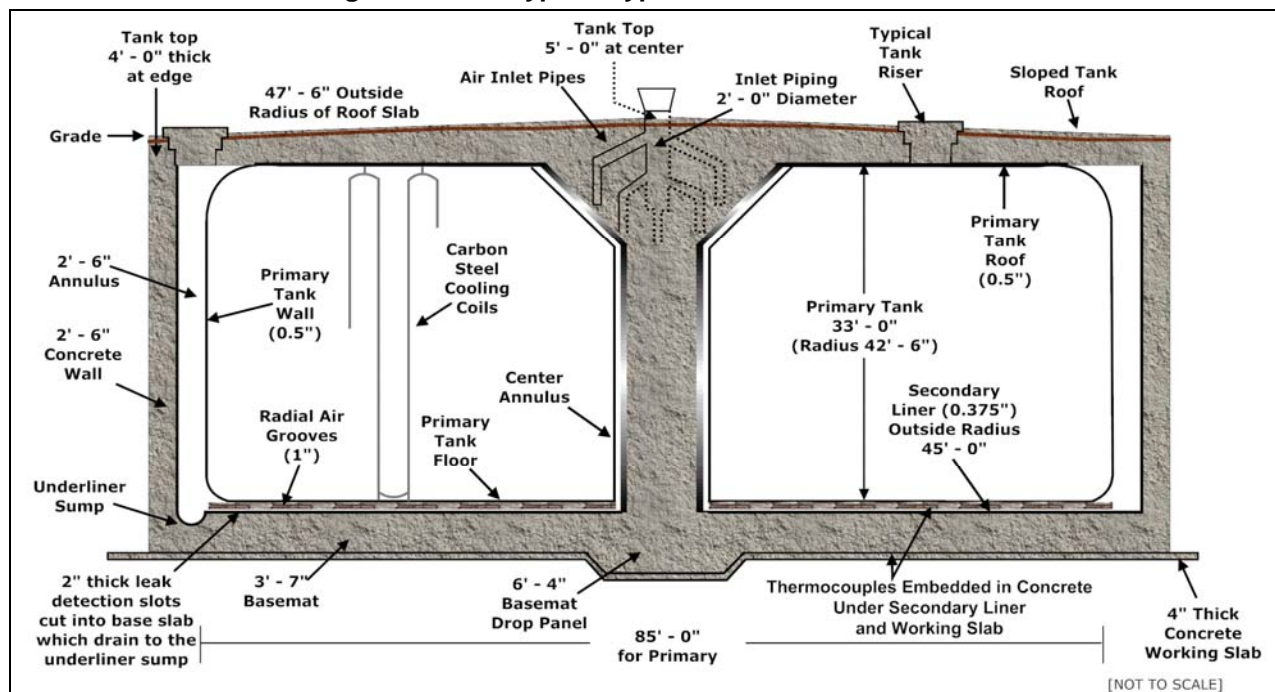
Typical Type IIIA Tank Cross Section
